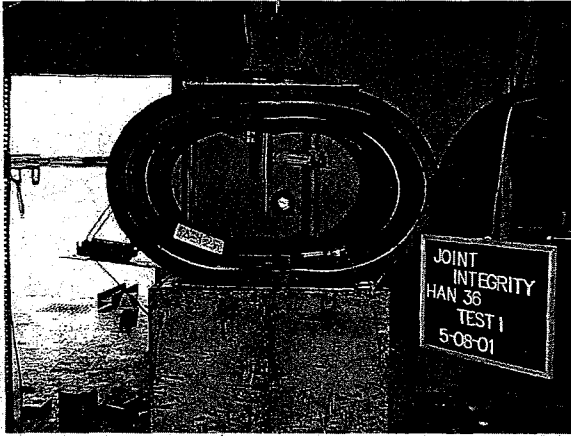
Interior View of Hancor36 Prior to Test
